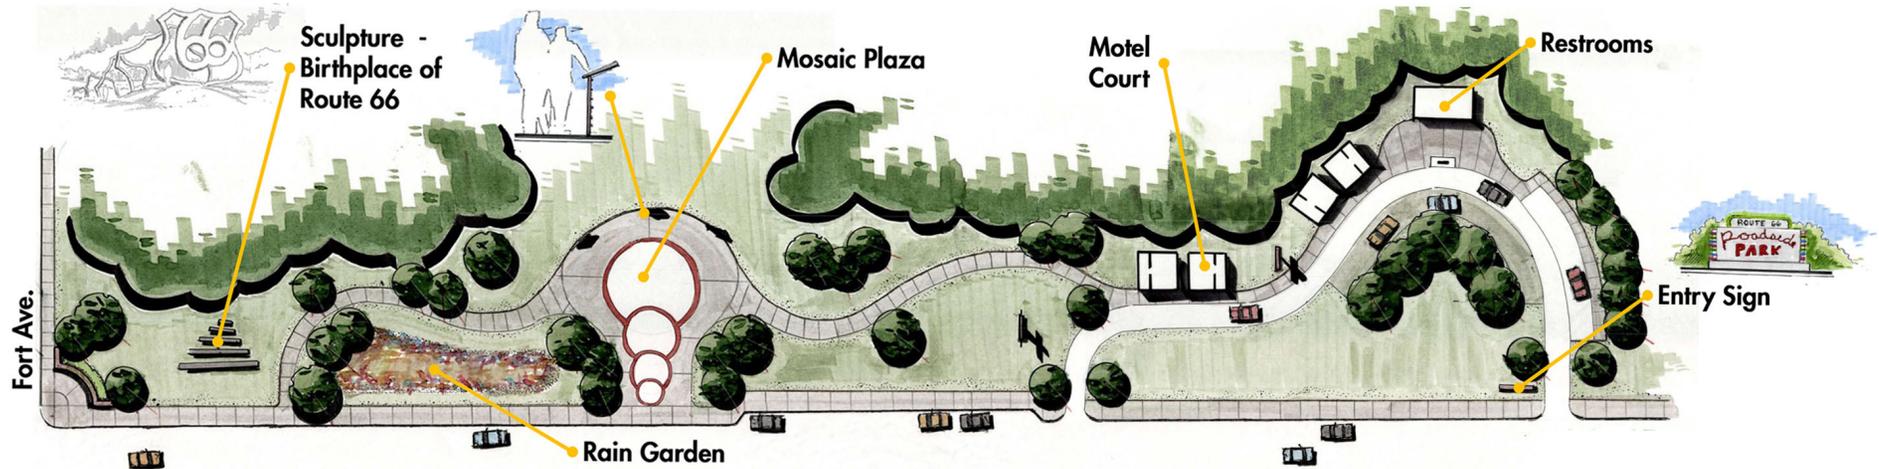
Plan of the transition park from Jordan Valley into the Route 66 Corridor
